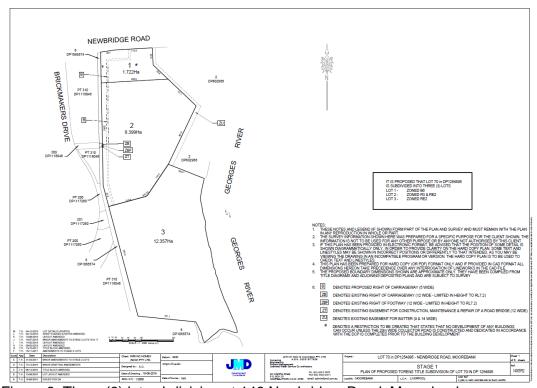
Three (3) lot subdivision at 146 Newbridge Road, Moorebank
